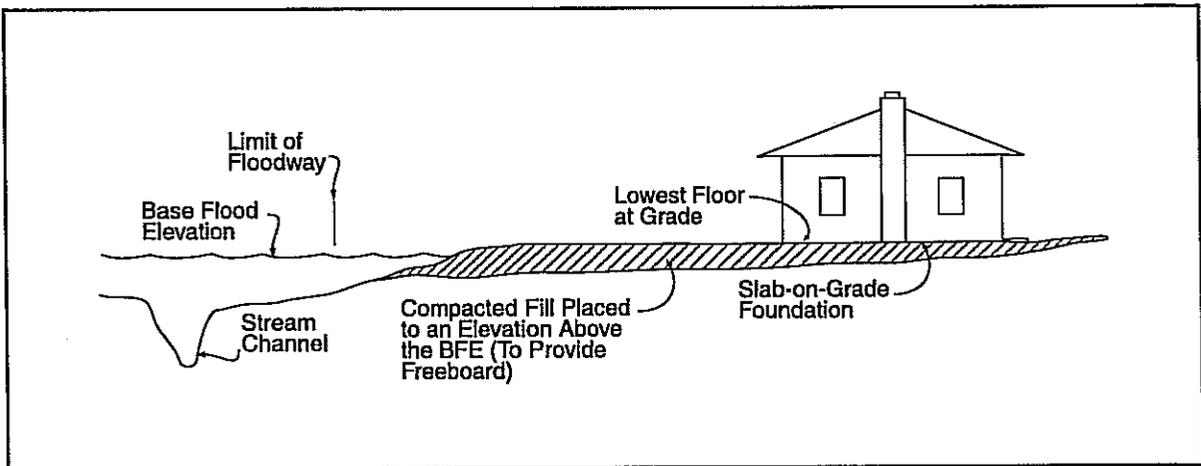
Structure on a slab-on-grade foundation. The lowest floor is typically slightly higher than the surrounding grade.
